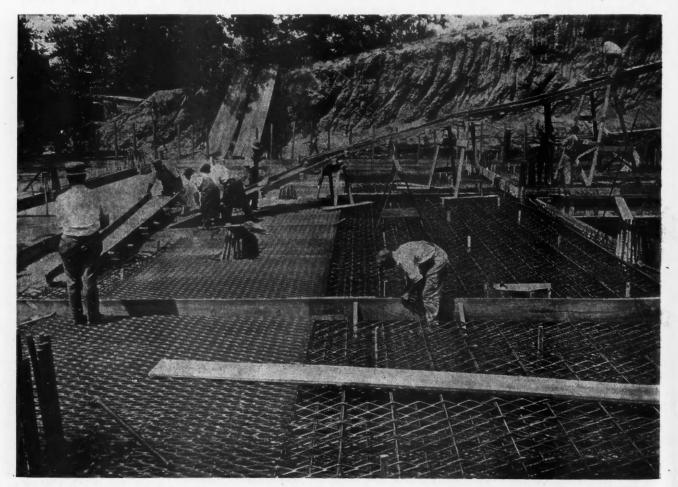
This Type of Construction, with Expanded Steel Reinforcing in the Concrete, Is Used for Large Storage Vaults Such as Those in Which Furs Are Stored.
